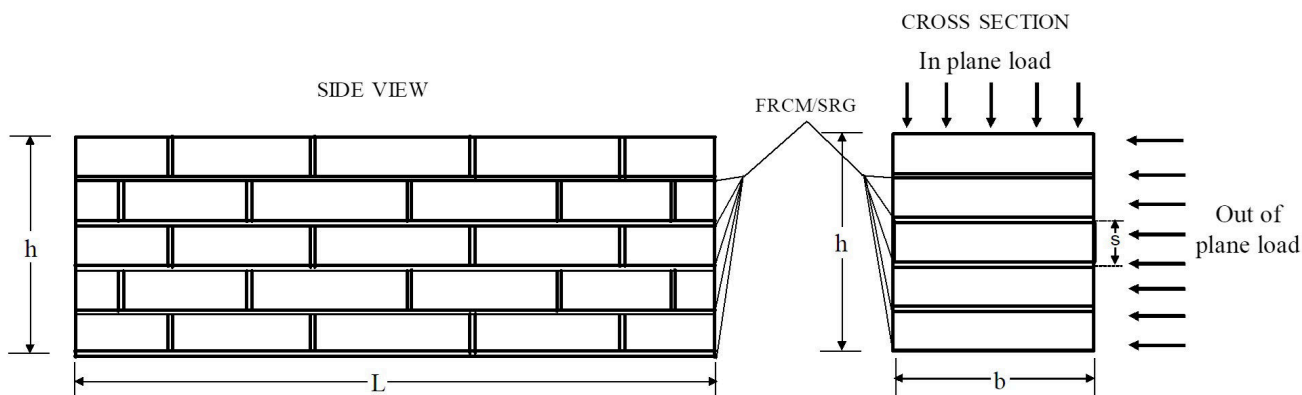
FRCM/SRG reinforced masonry crowning-beam: geometrical properties and load patterns.
